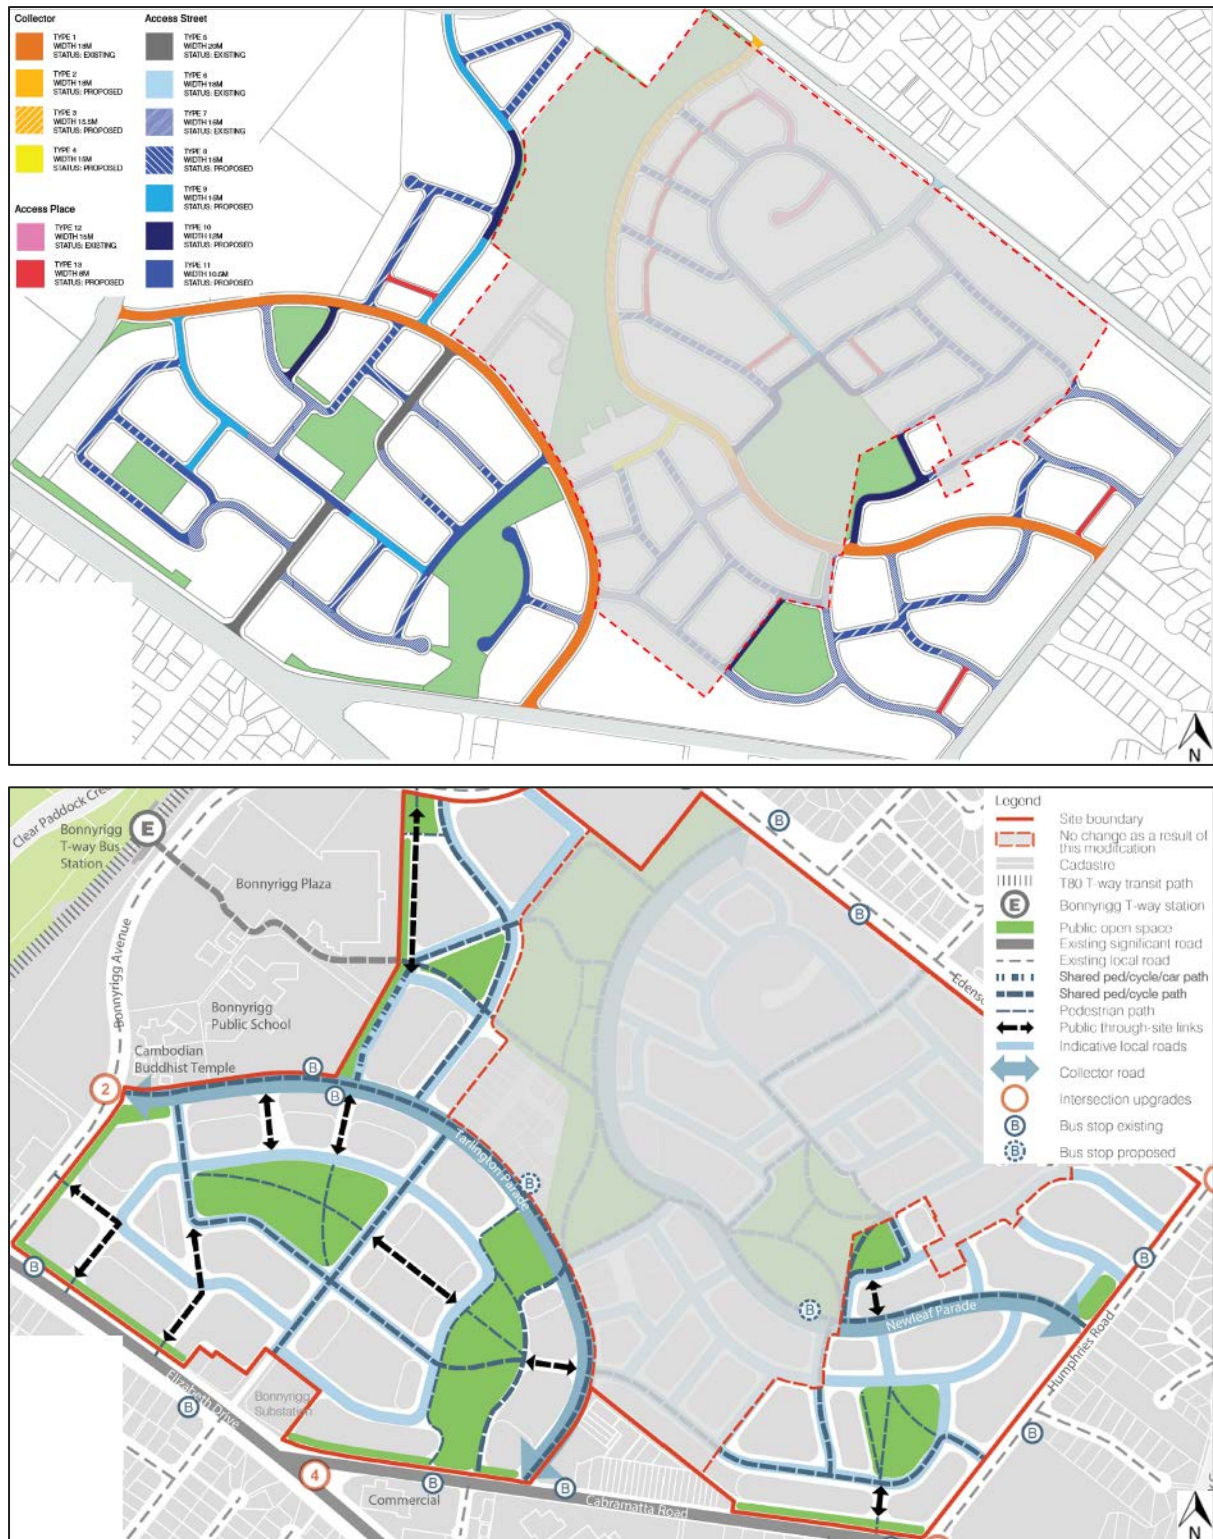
| Approved (top) and proposed (bottom) road layout and pedestrian through site links (Base source: Proponent's Rts)
